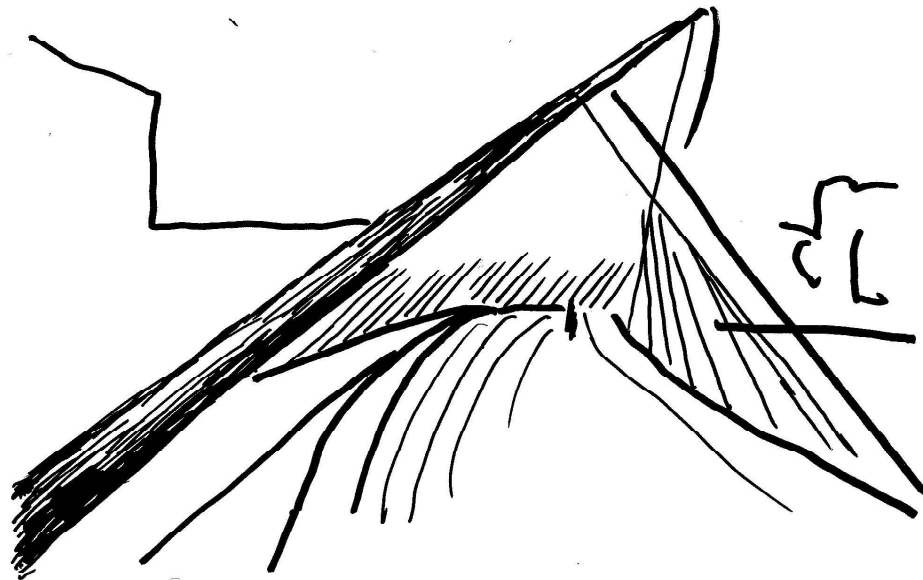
The presented foodbridge of Santiago Calatrava, Campo Volamin in Bilbao, is realized as ferroconcrete construction. Steel suspension members are used.
